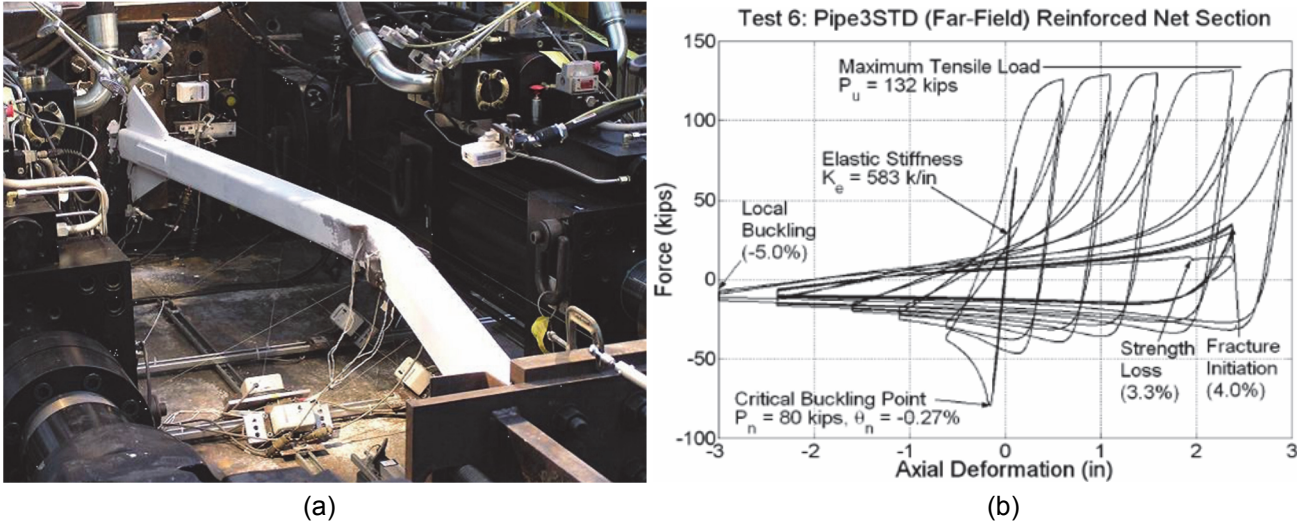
Test specimen and data for concentric brace (Fell et al., 2009).
